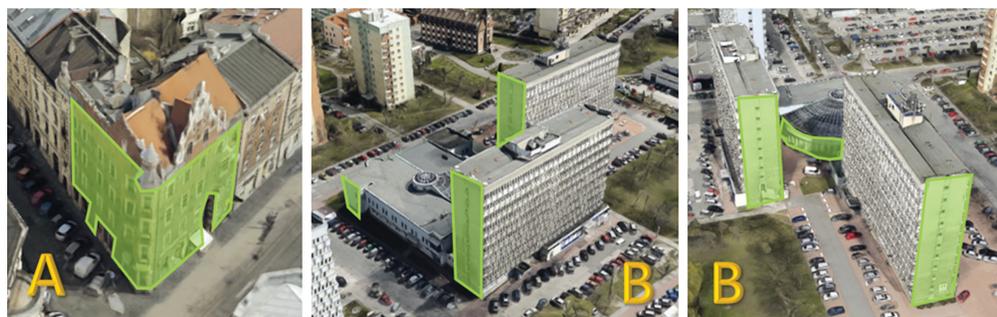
Visualization of green walls on the facades of the analyzed buildings. The area of green walls excluding window and door openings is marked in green. A – tenement building “Pod Pajakiem”, B – Municipality of Krakow, own work based on photo from [21]
